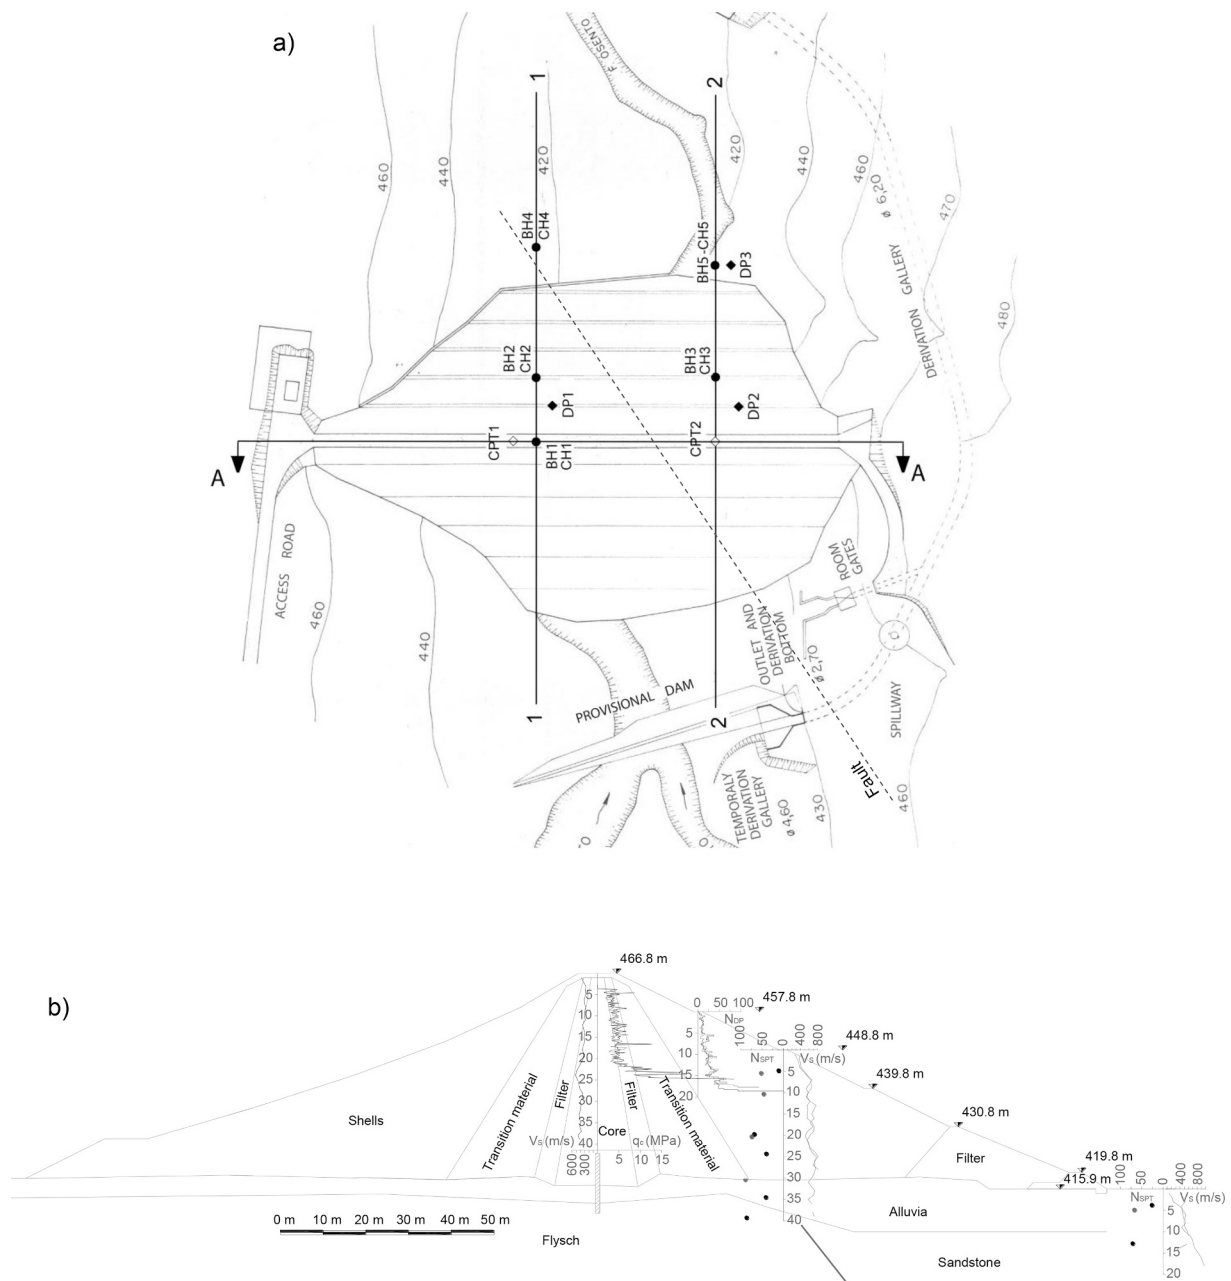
San Pietro dam: a) plan view and location of geotechnical investigations; b) cross section of the dam (adapted from Calabresi et al., 2004).
